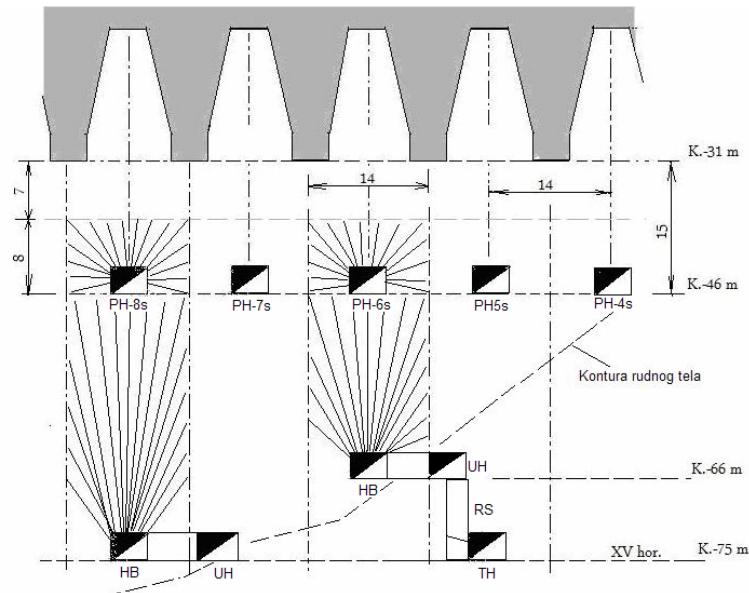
Proposal of the I variant of mining method with leaving the open slopes for excavation the lowest parts of the ore body Tilva Ros
